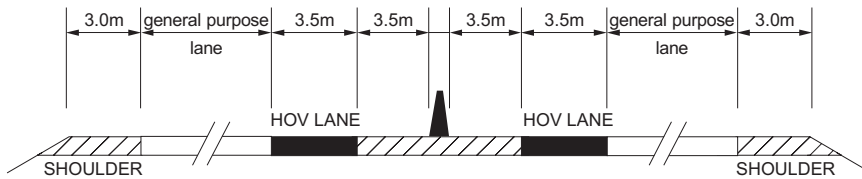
Concurrent Flow - Non-Separated HOV Lanes Cross Section
